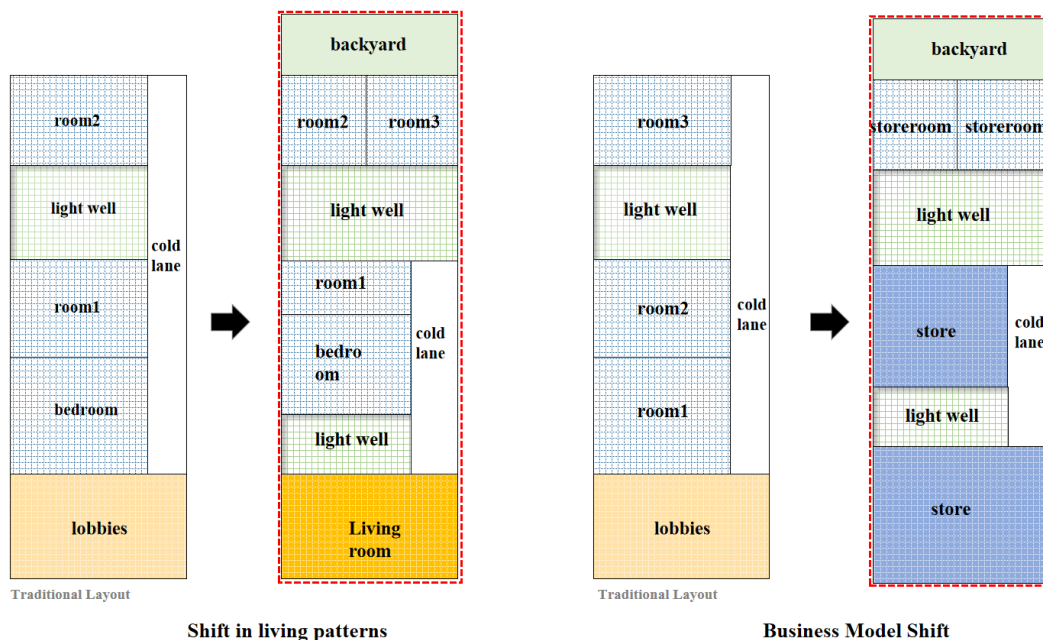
Floor plan layout of a modern bamboo house (Source: by the author)
